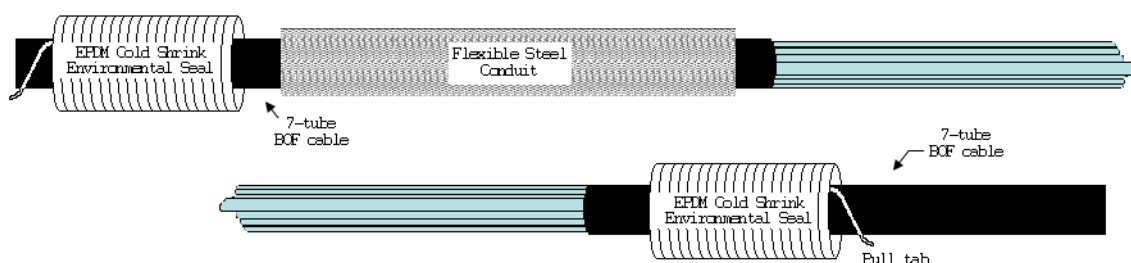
C2-2. 7-tube BOF cables with cold shrink and conduit.
